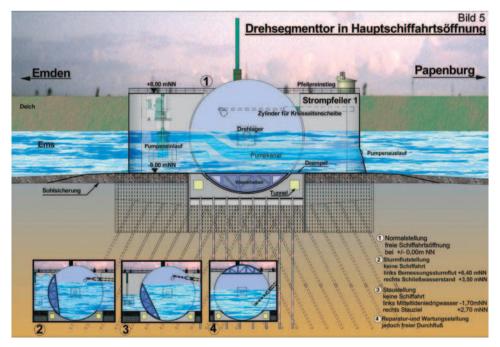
Cross-section of pier No. 2/© NLWKN Aurich
